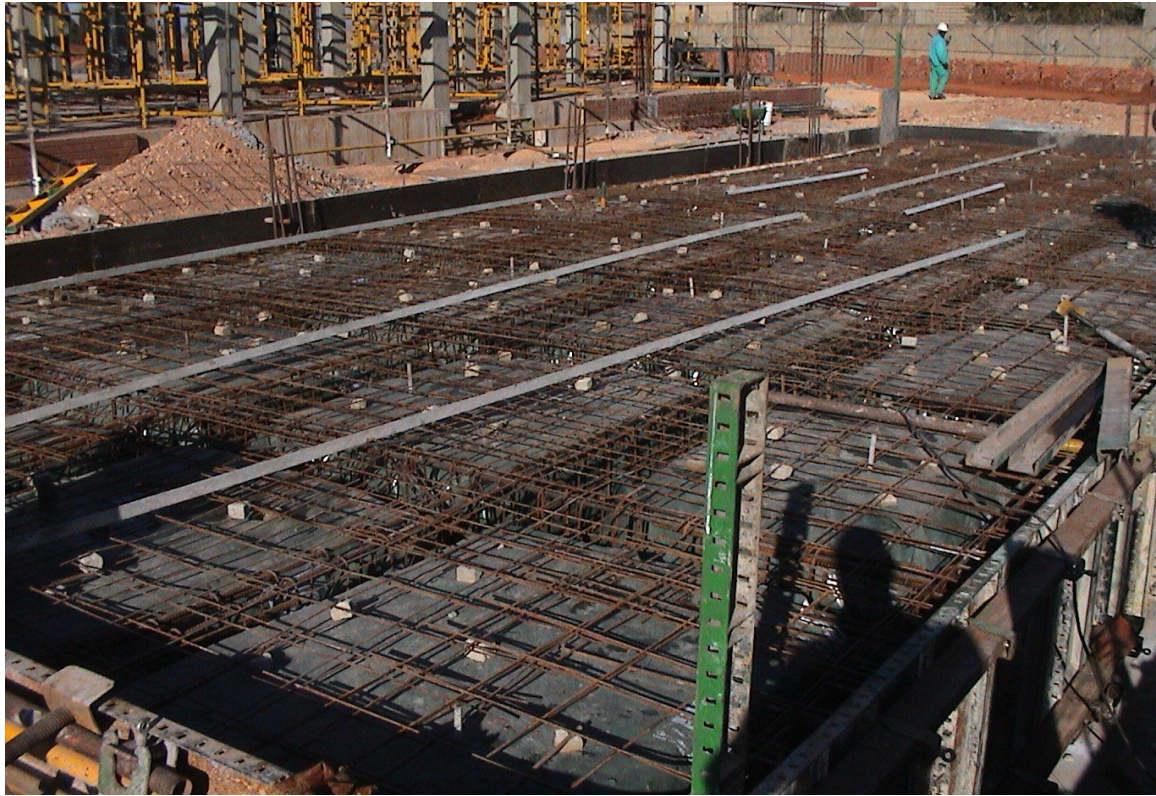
TYPICAL REINFORCED CONCRETE RAFT FOUNDATION
